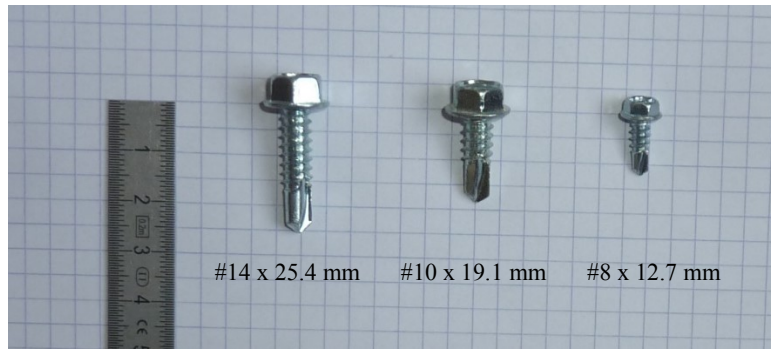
Self-drilling hex washer head screws used in the specimens (scale in cm)
